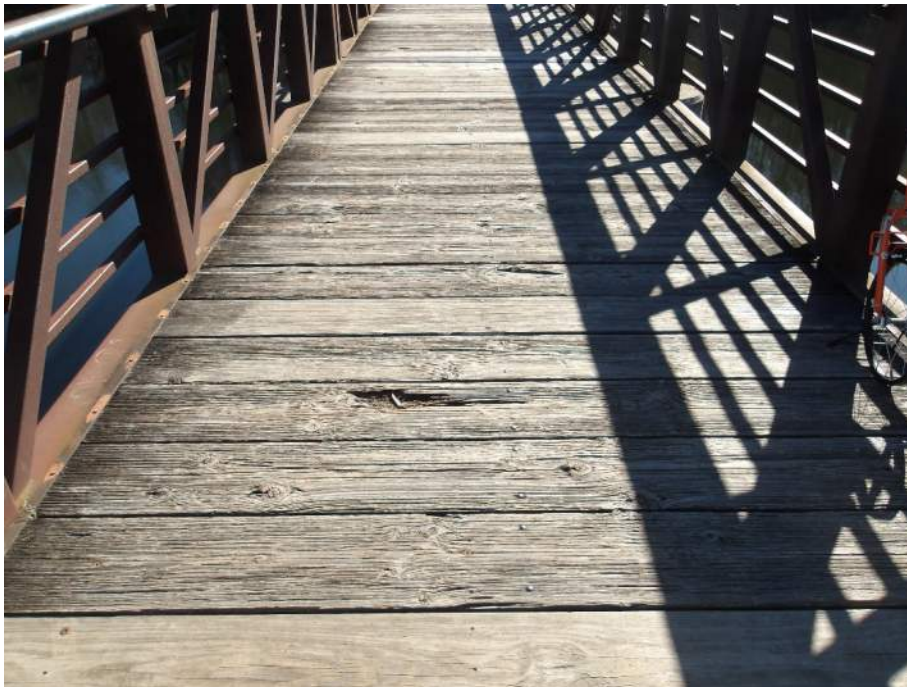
Deck Deficiencies at Pier 2S (Looking South)
